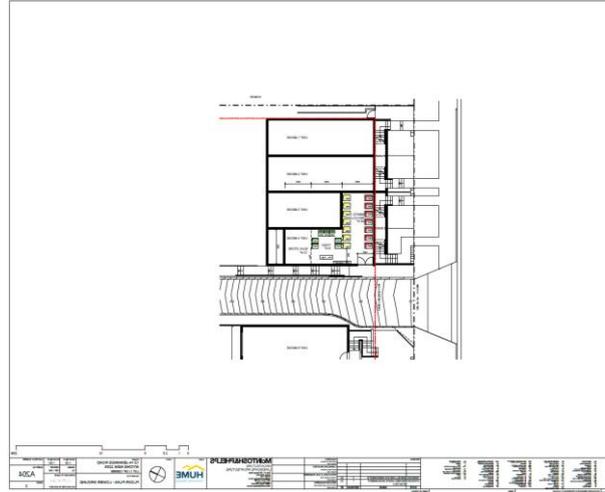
Proposed lower ground floor plan (refuse room for 21 bins)
